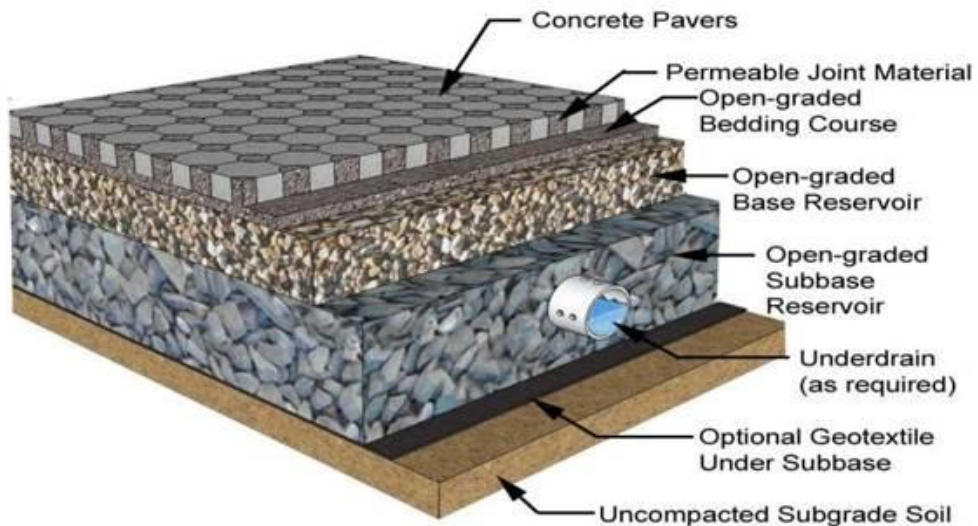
Typical cross section of modular permeable pavement system. Source: Smith, 2006
